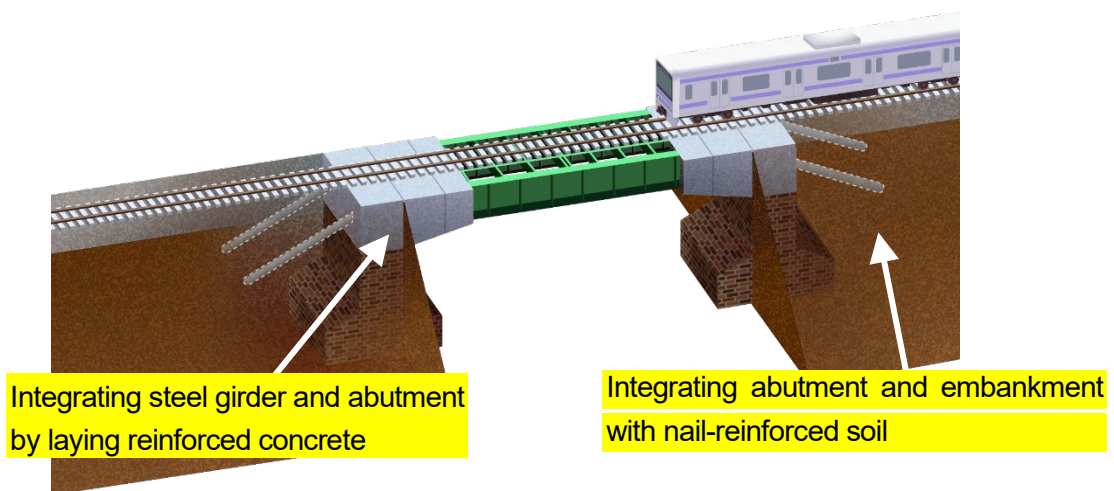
Bridge reinforcement method integrating steel girder, abutment and embankment
